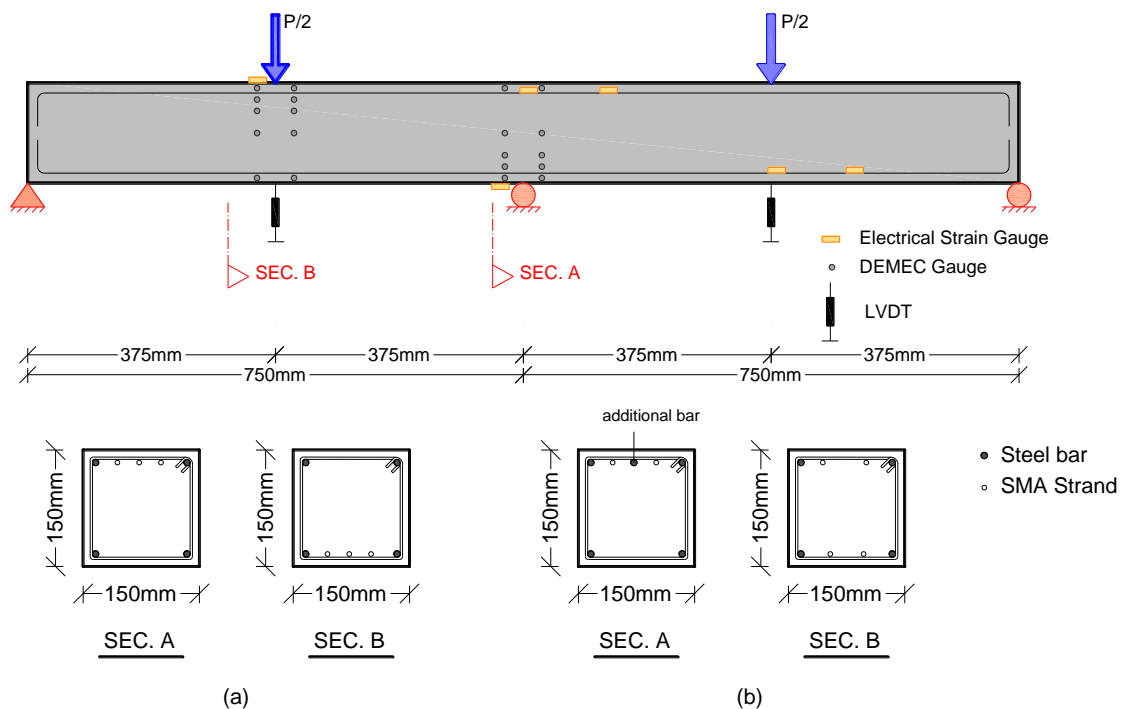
Longitudinal profile and reinforcement details of (a) Group 1; (b) Group 2 (all dimensions in mm)
